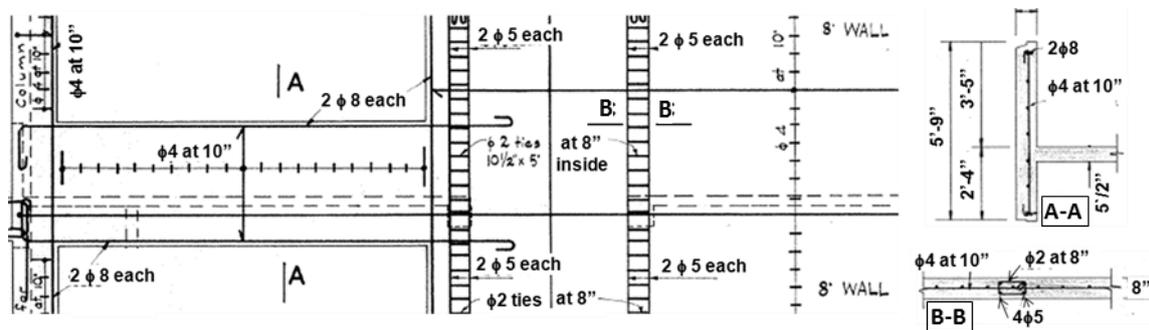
Reinforcement detail of a typical wall and coupling beam elements
